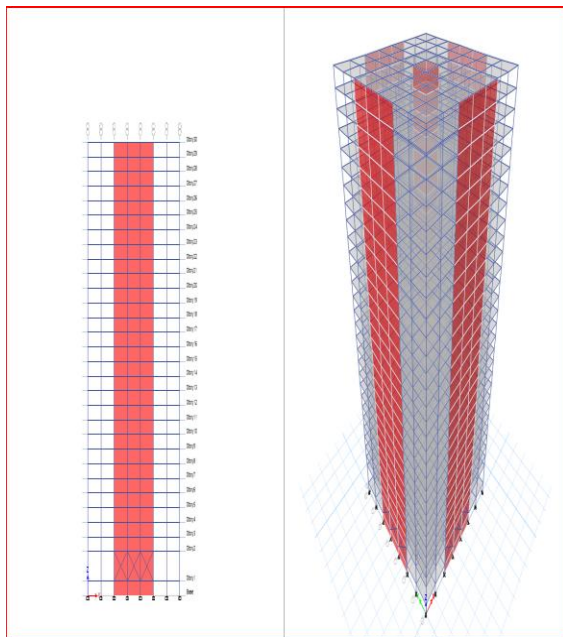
Elevation and 3-d view of Soft Story model with diagonal stiffeners
